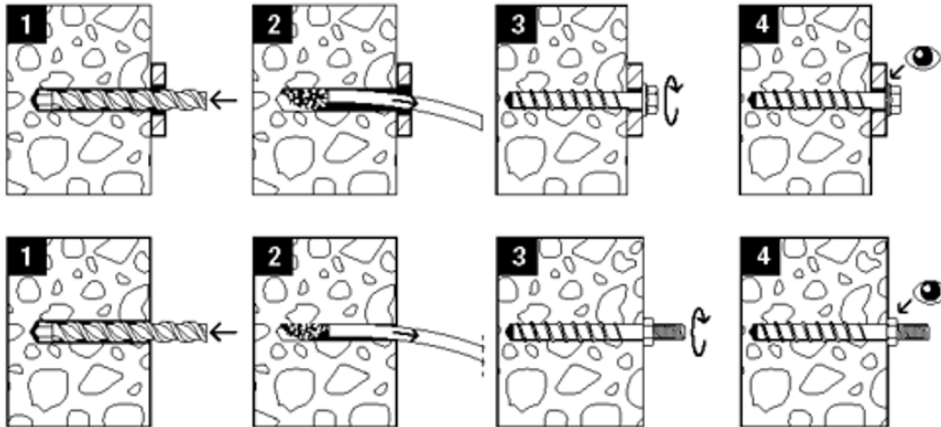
Installation of the concrete screw according to the manufacturer installation instruction (top: push through installation, bottom: predrilled installation).
